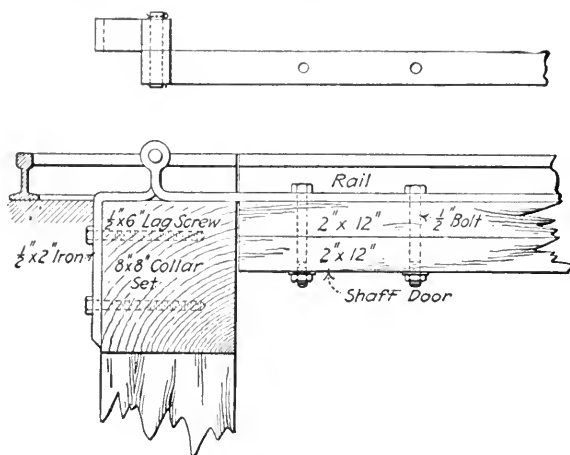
SHAFT DOOR WITH WROUGHT HINGE OF SPECIAL DESIGN.
